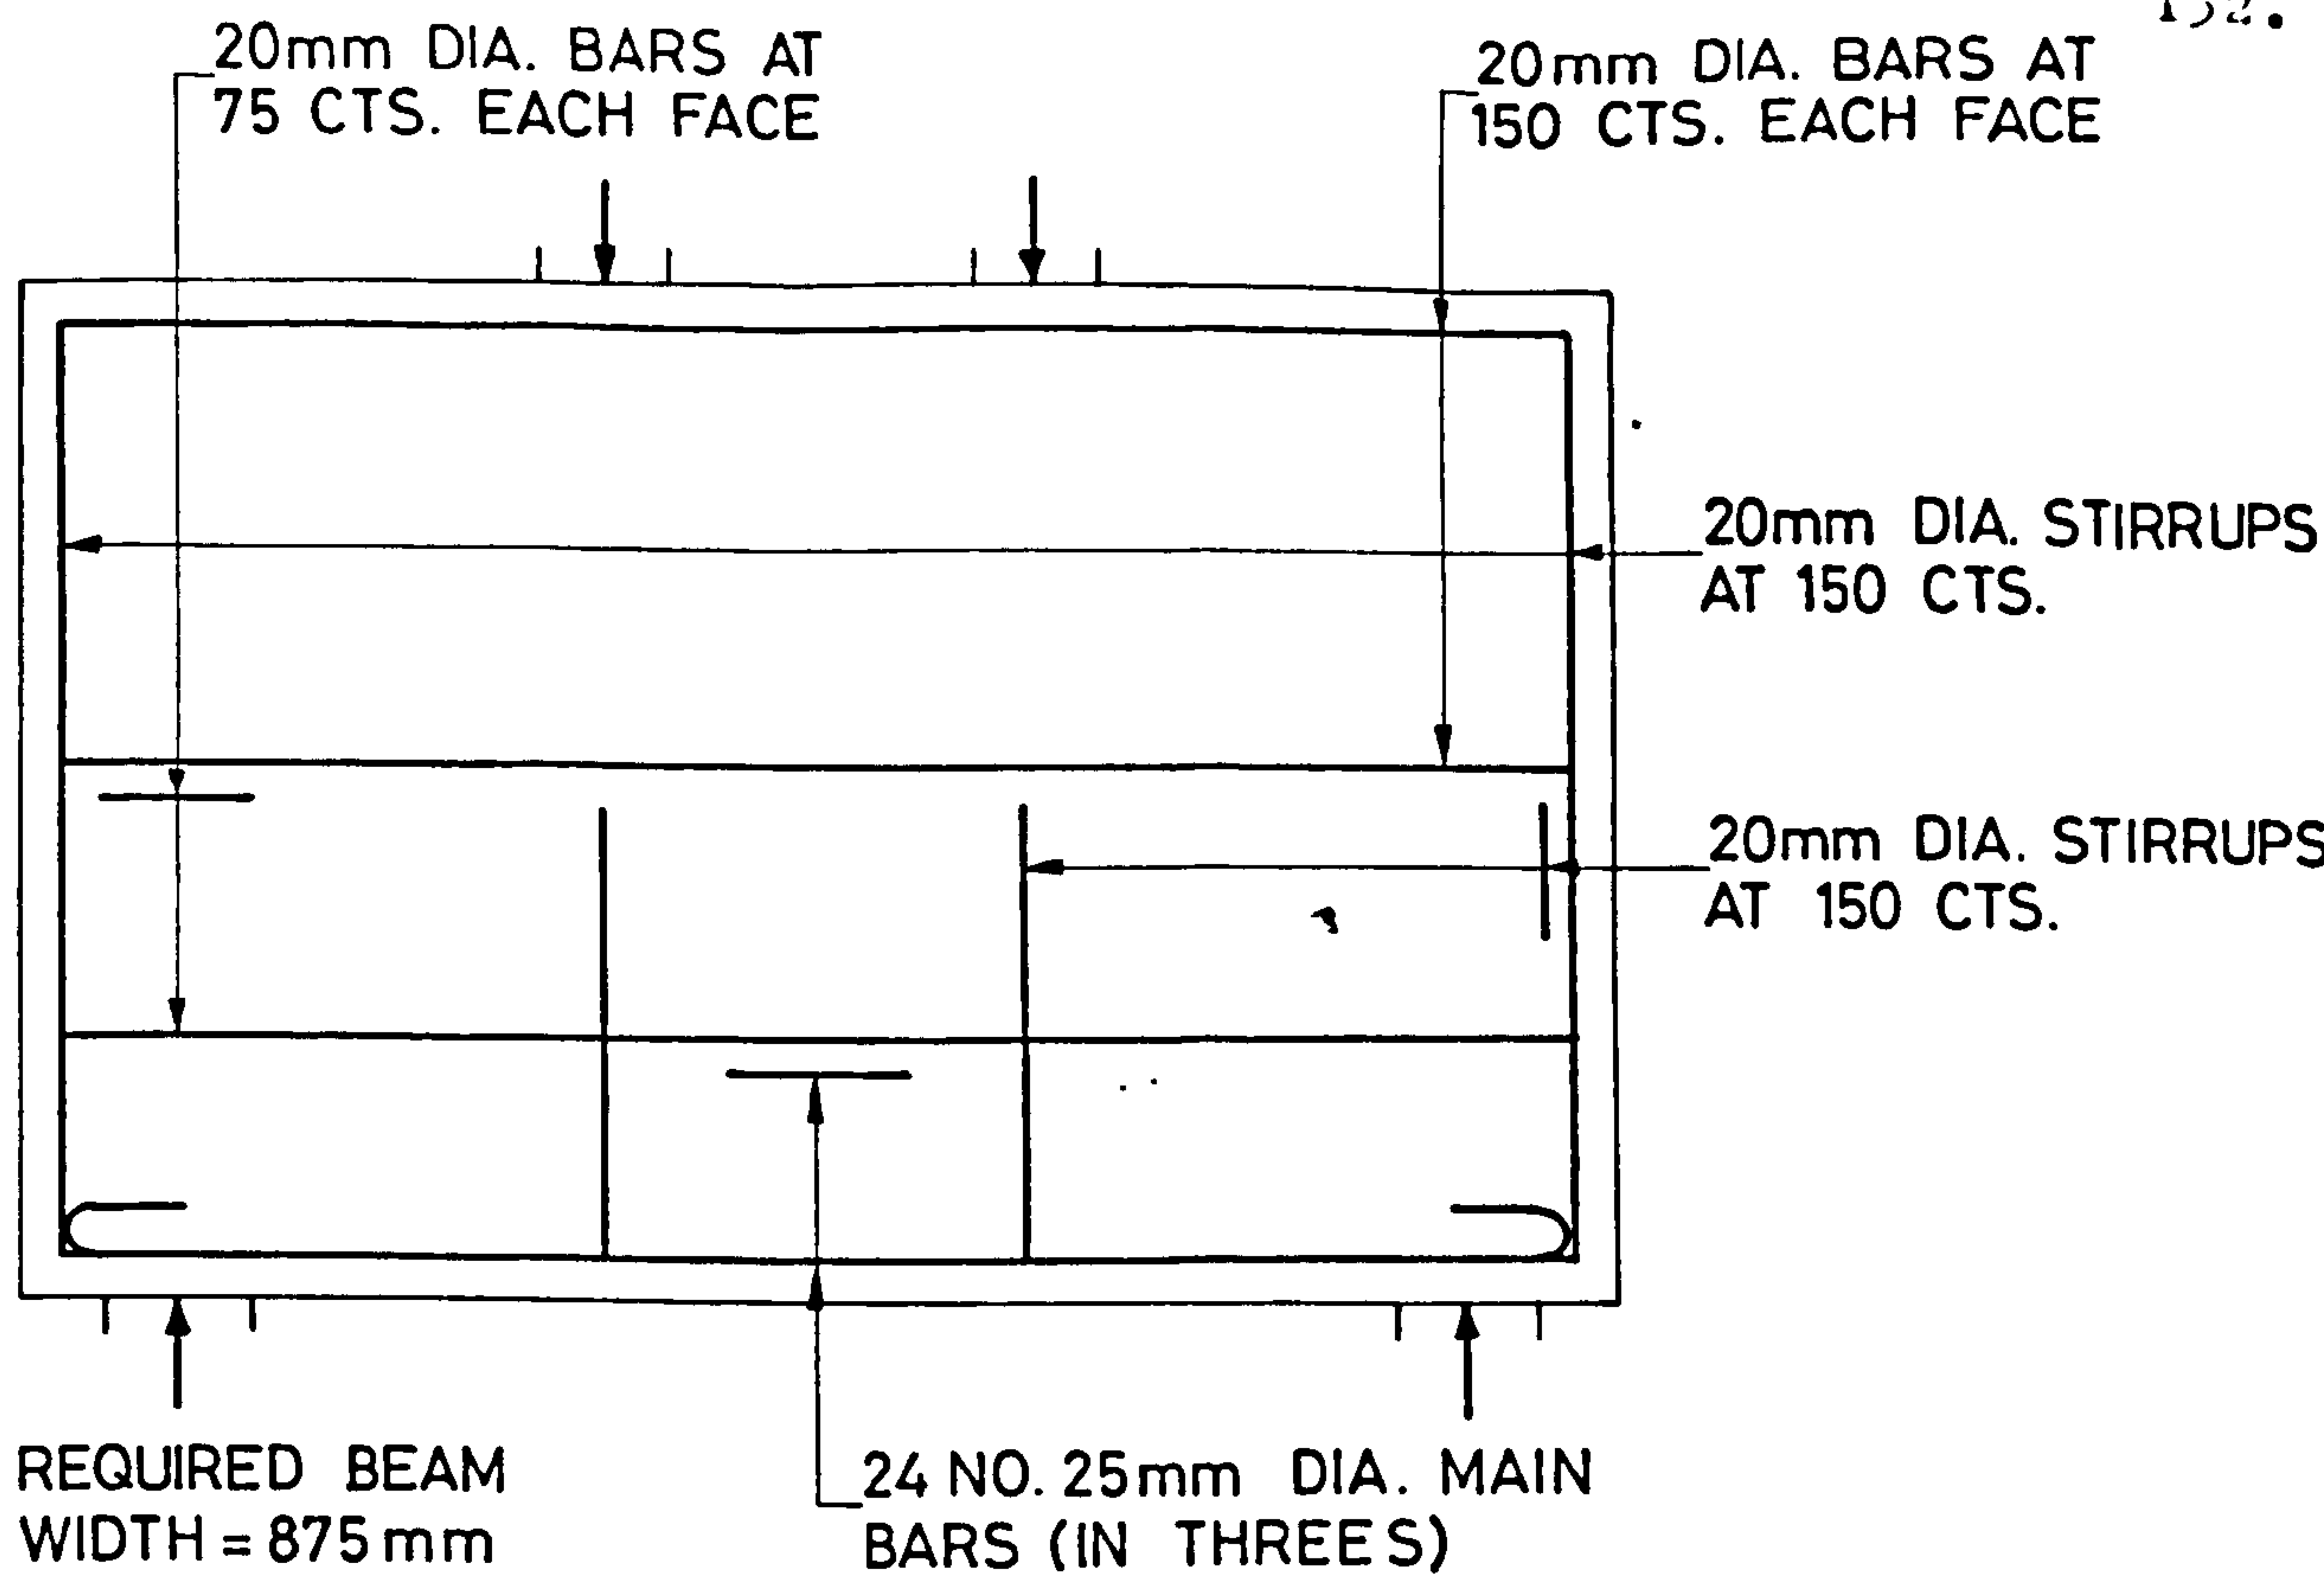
BEAM DESIGNED TO CEB-FIP RECOMMENDATIONS
